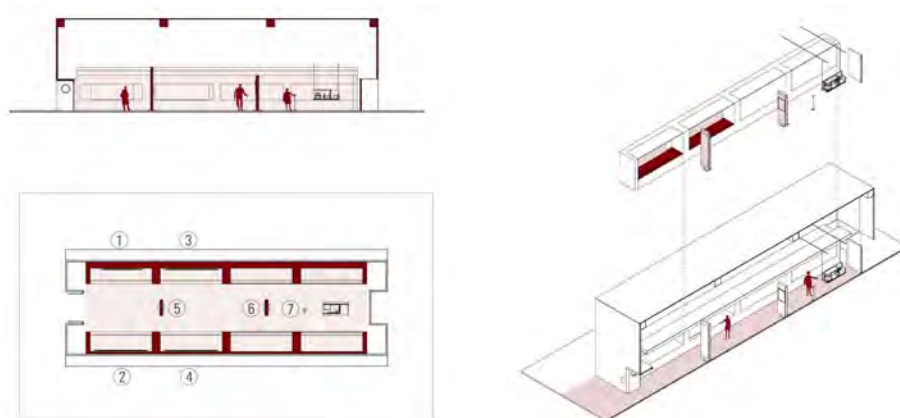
Gino Valle's room. Plan, section and axonometric cross-section.
